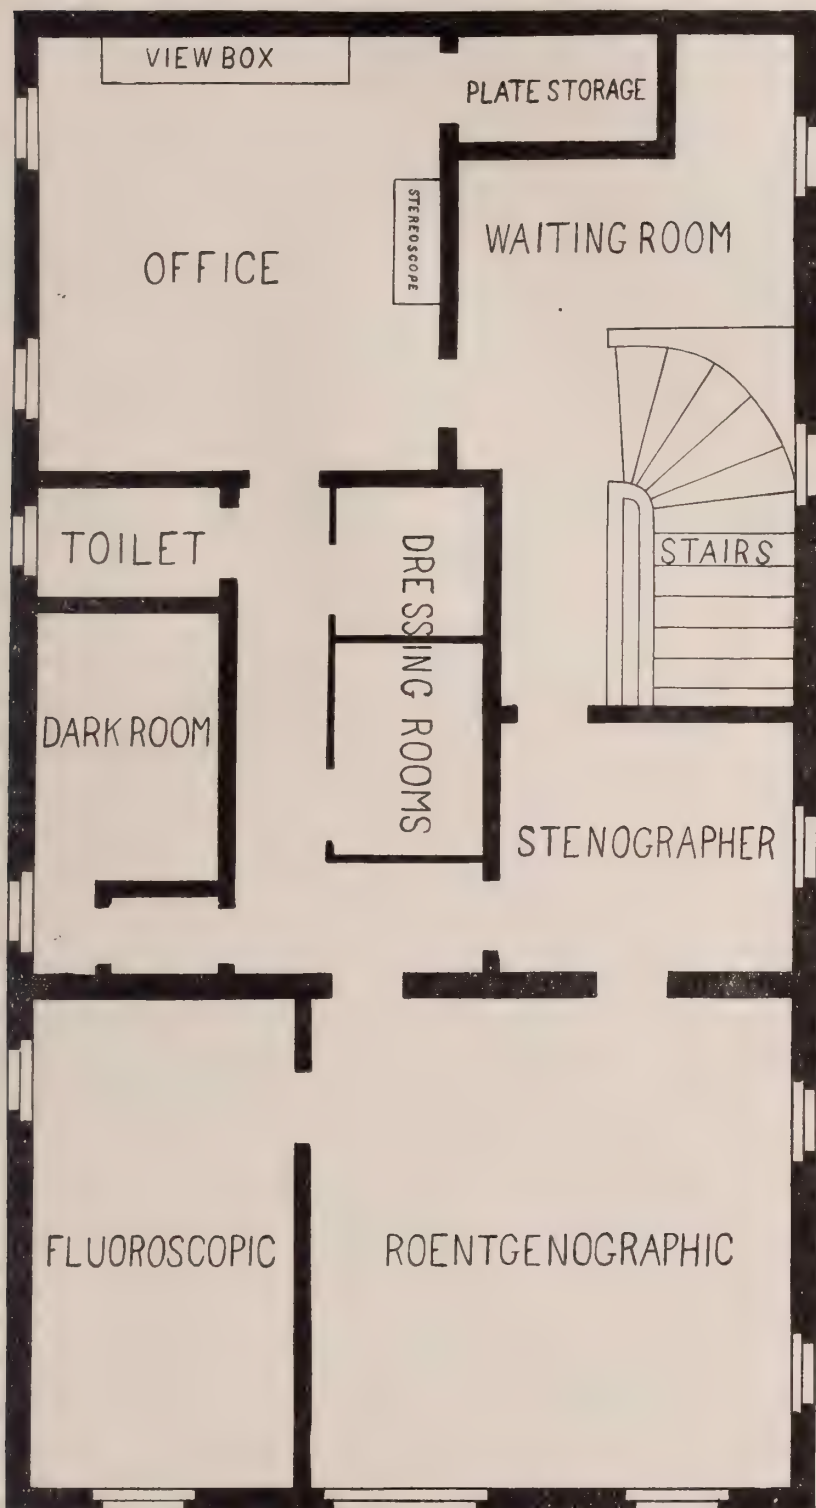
Floor plan of x-ray laboratory showing arrangement of rooms.
